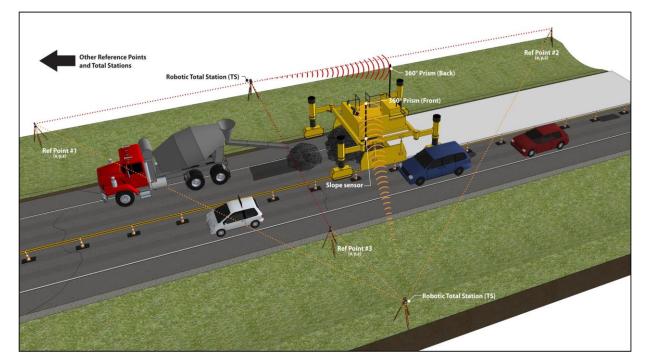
H-1.04: Typical Layout of Control Points on Stringless Paving Applications
